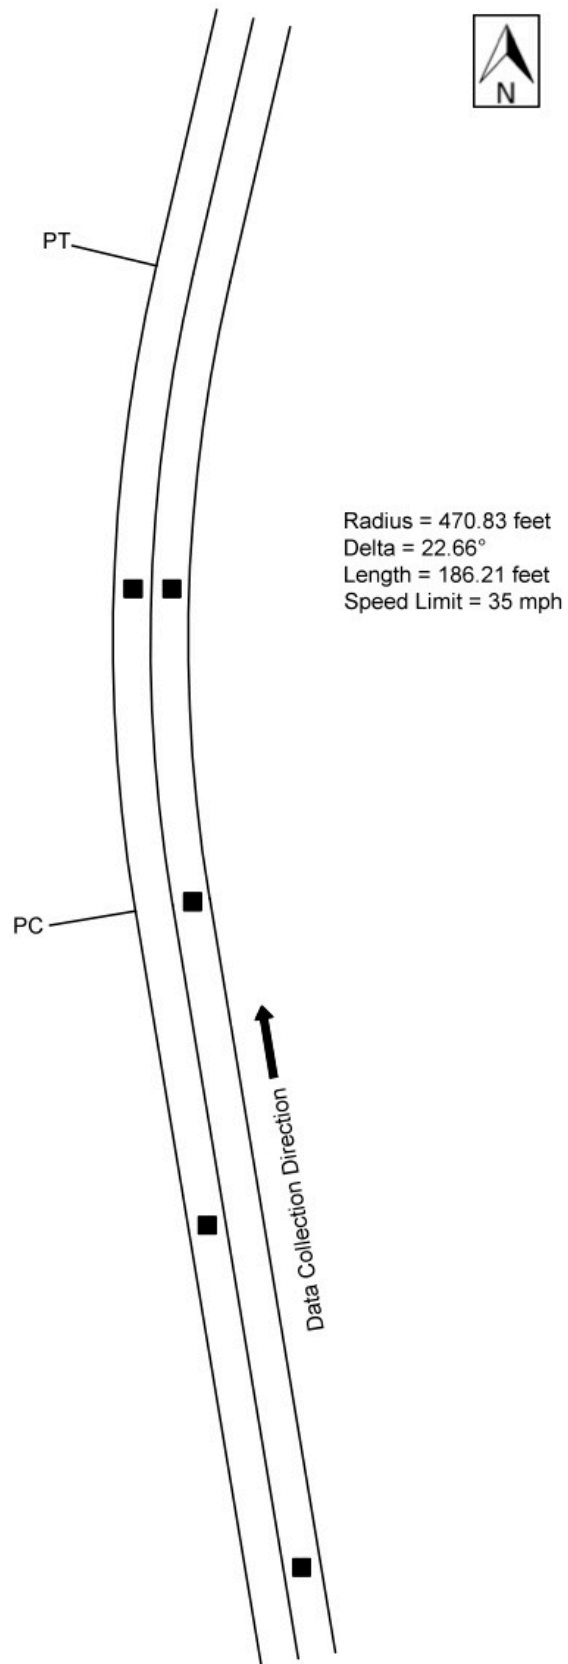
Diagram. Geometric layout of northbound New Boston Road (not to scale).
